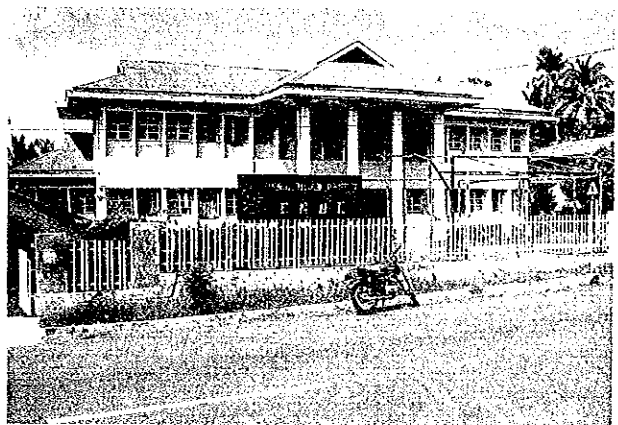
Ende City Office, Severe Damage, Remaining Story Drift 10 cm
